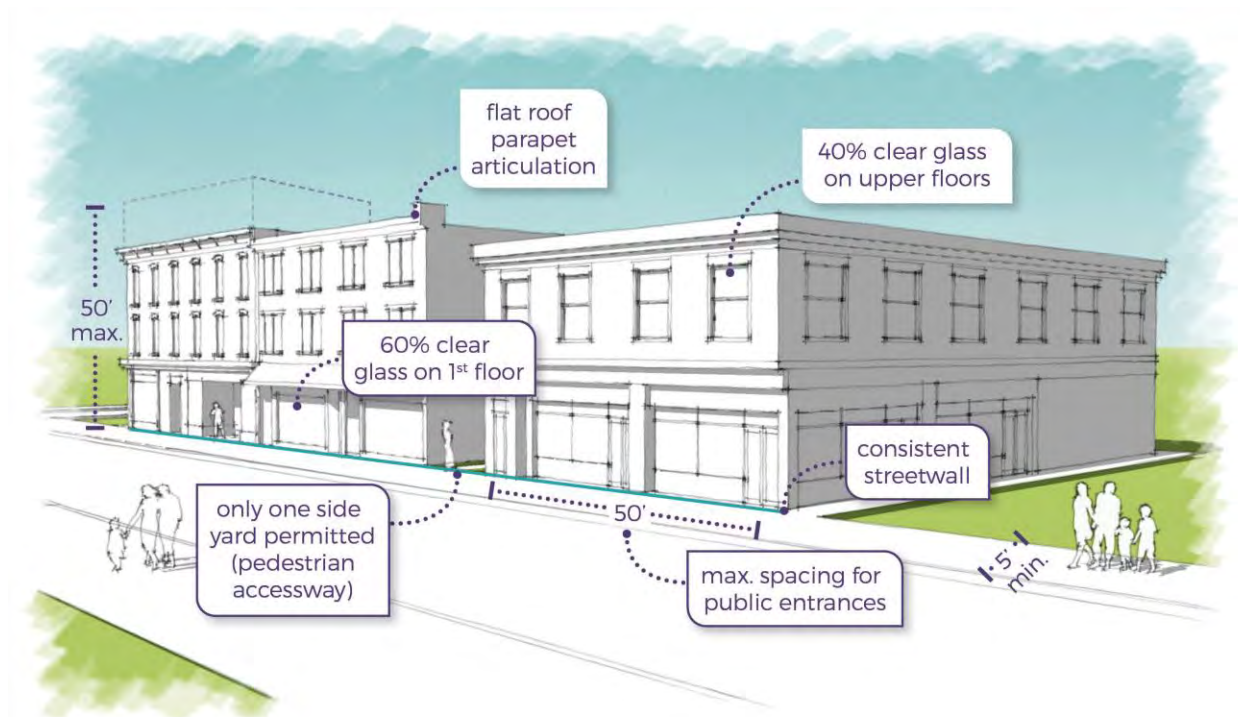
C-1 SITE DEVELOPMENT REQUIREMENTS
